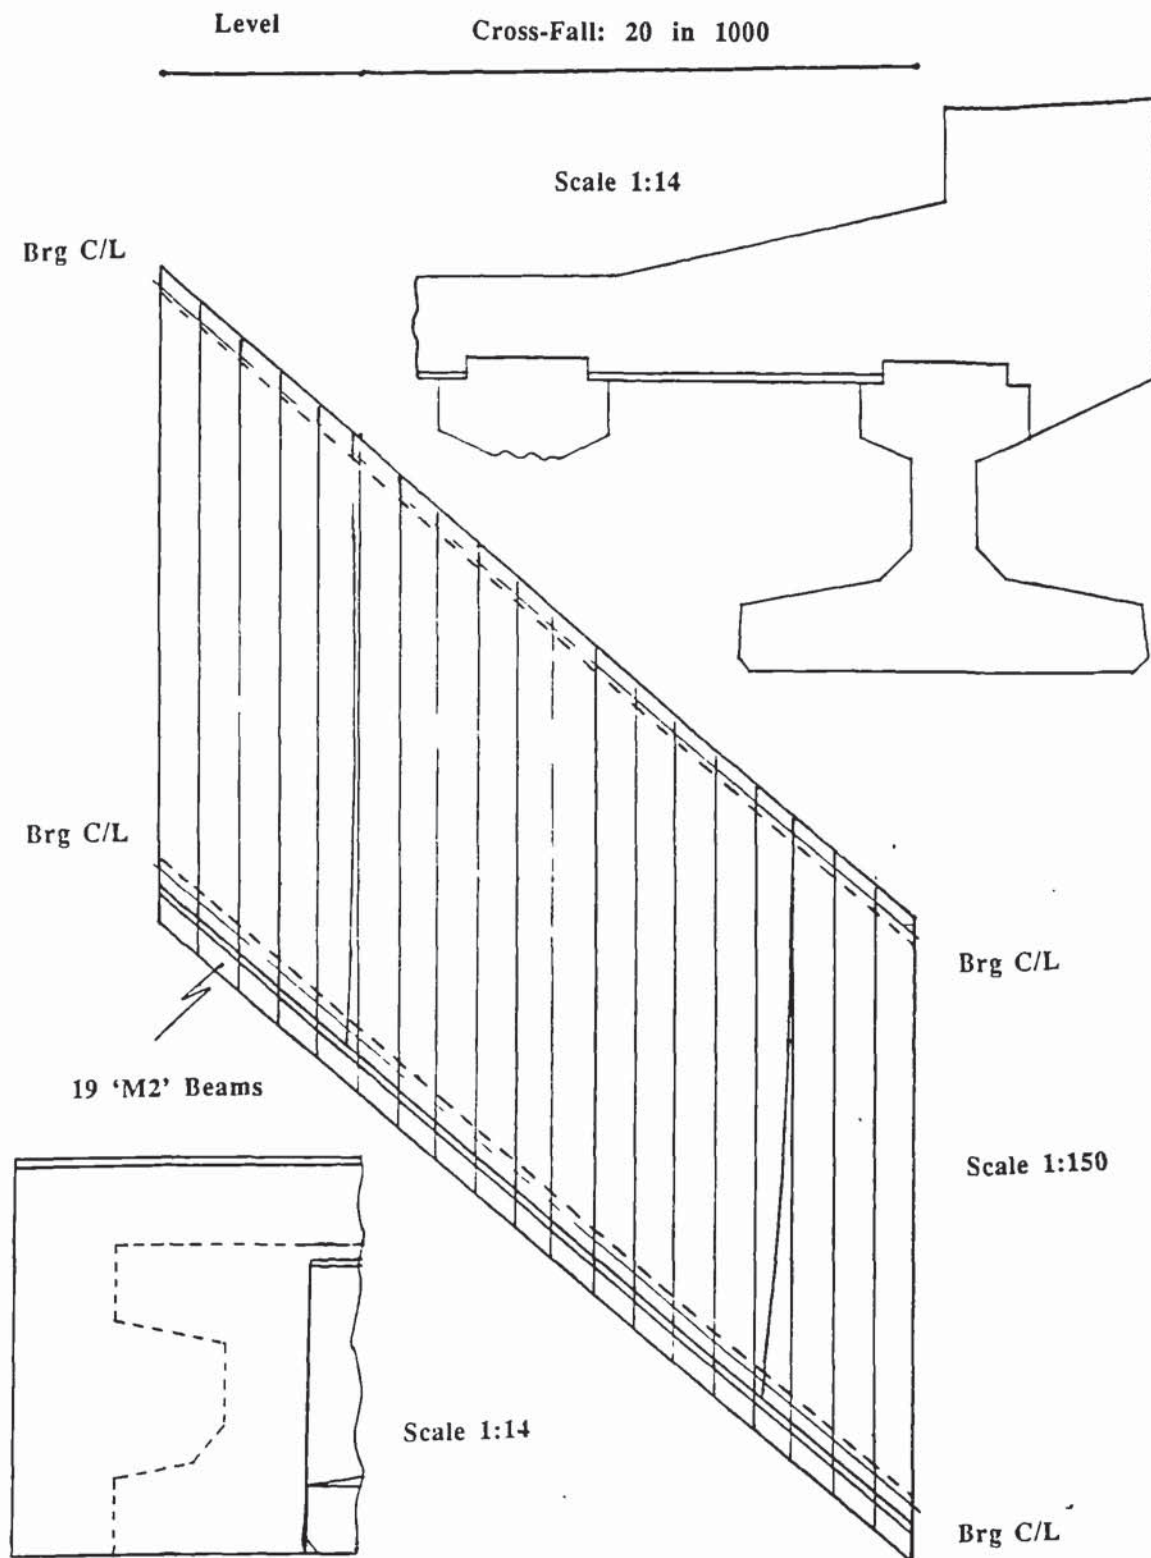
(a) Structural detail schematic of New Haymills Bridge
